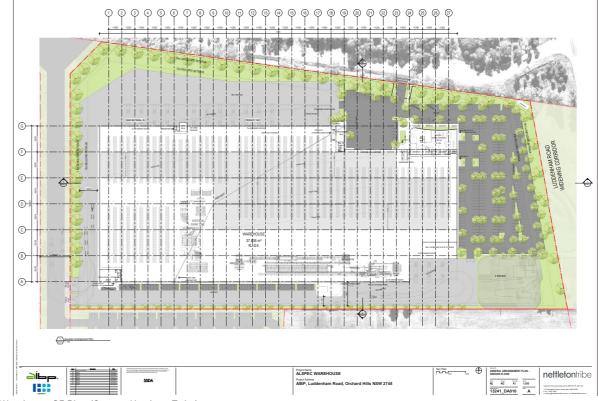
Warehouse GF Plan (Source: NettletonTribe)
